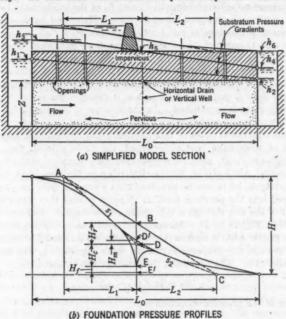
Simplified Model Section (a), with Foundation Pressure Profiles For Assumed Conditions
